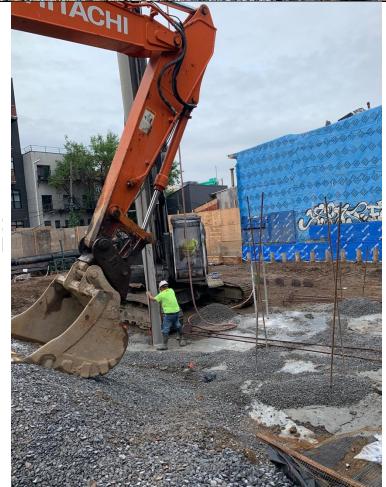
View of hopper attached to piledriver to be used for soil improvement grouting. View is N towards grid B2.
